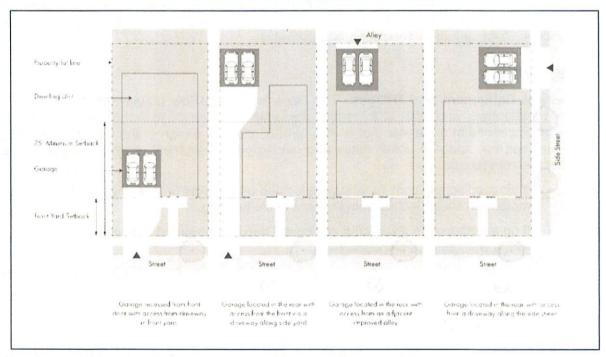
FIGURE: UNACCEPTABLE LOCATIONS FOR VEHICLE PARKING GARAGES AND ACCESS
